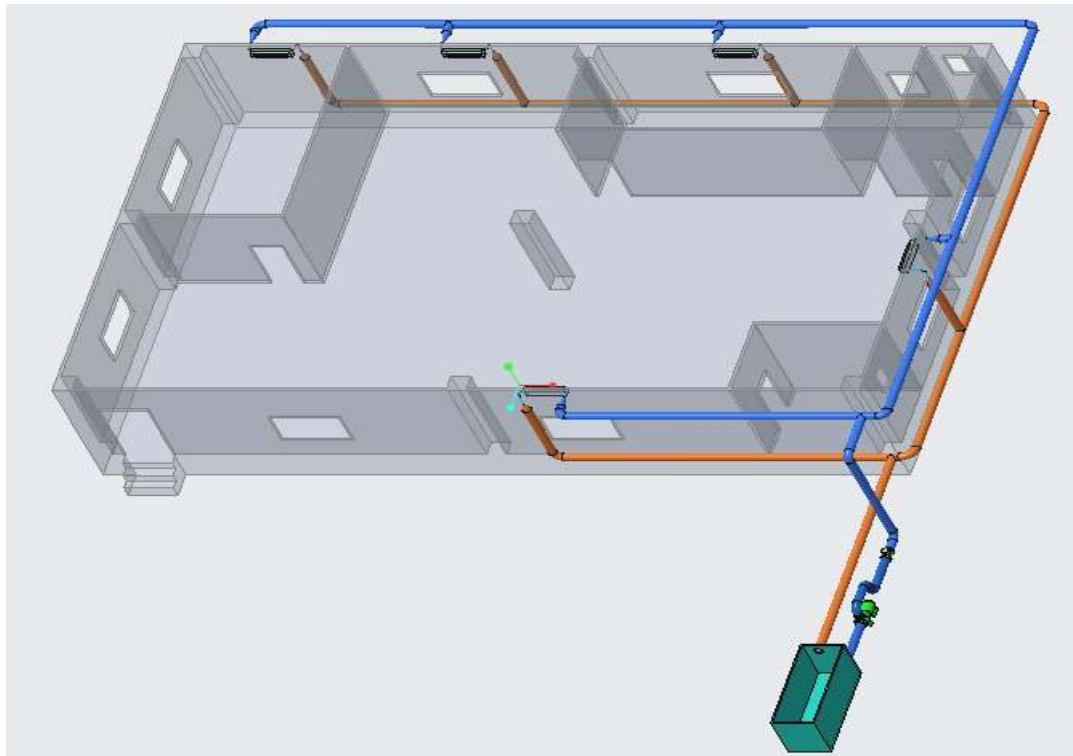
3D model of the office building with air conditioner, inlet and outlet pipe with pump and chiller
